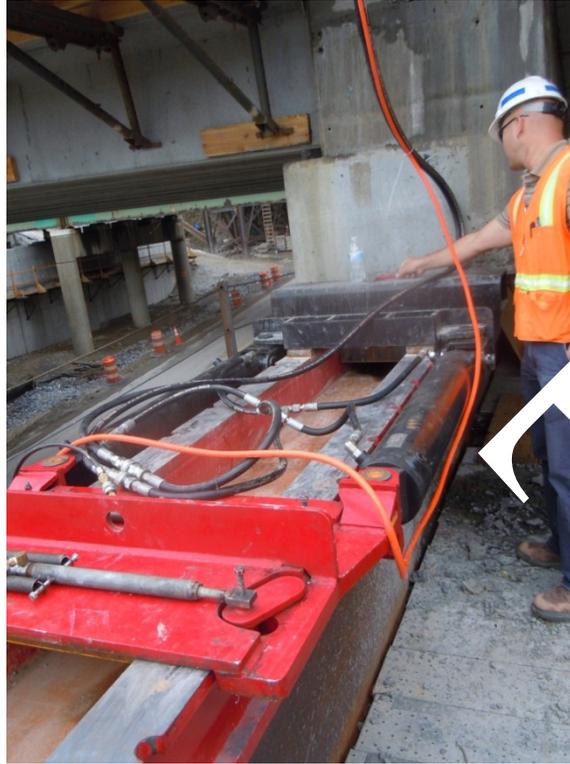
Photo. Push Gripper assembly pushing the end diaphragm.
